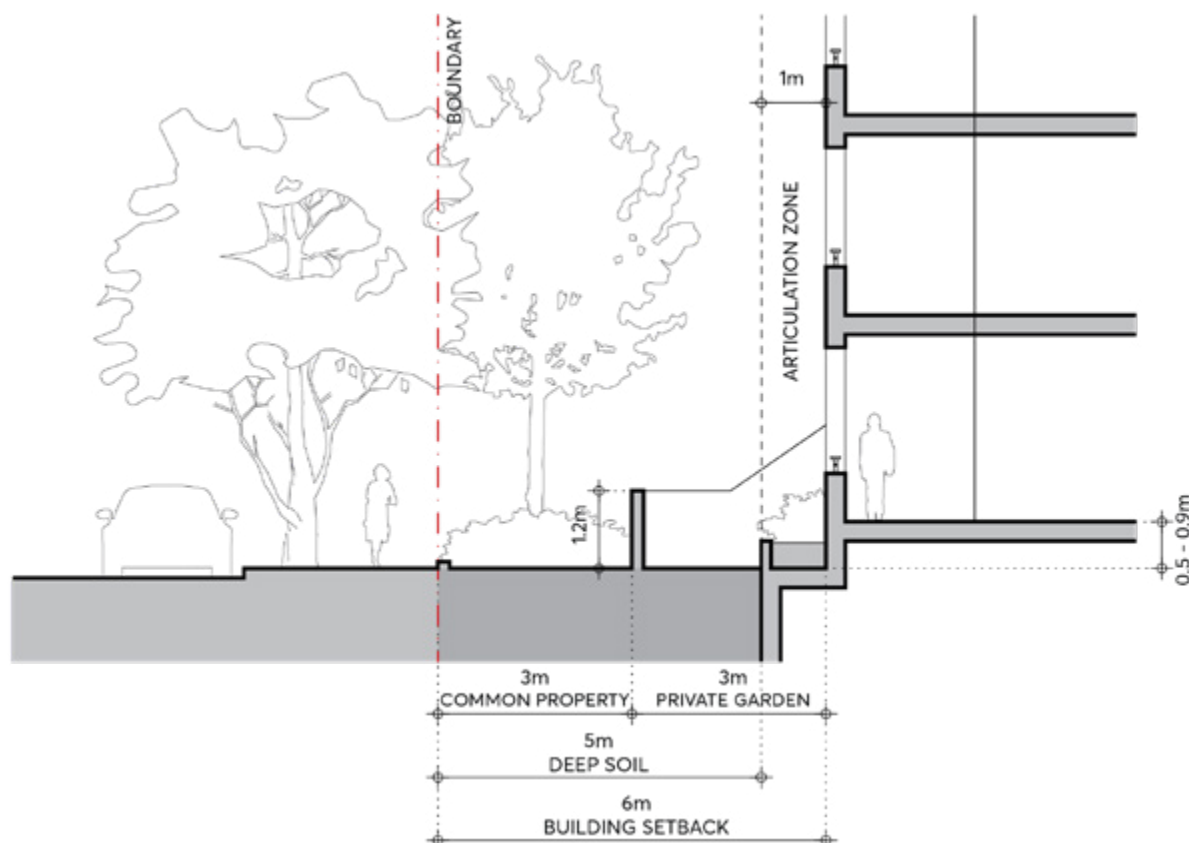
Residential Ground Floor Street Frontage
